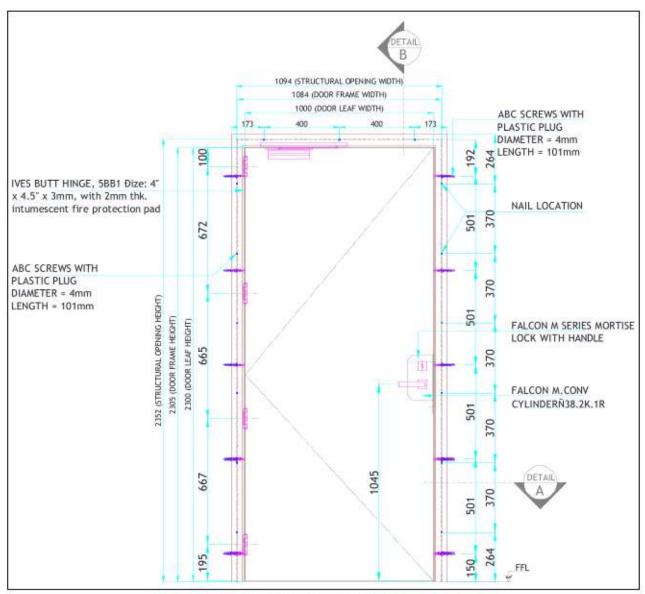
Detail D of drawing 4). (Drawing provided by the test sponsor)
